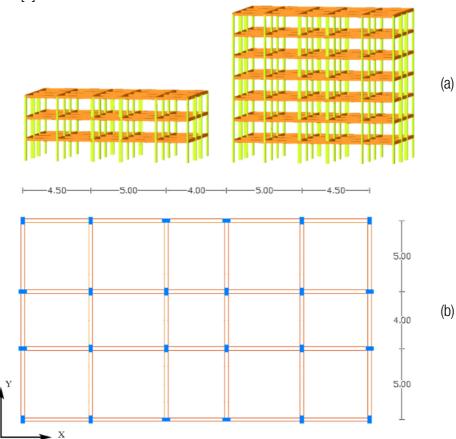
a) Structural plan (units in m); b) Elevation view of the frames
